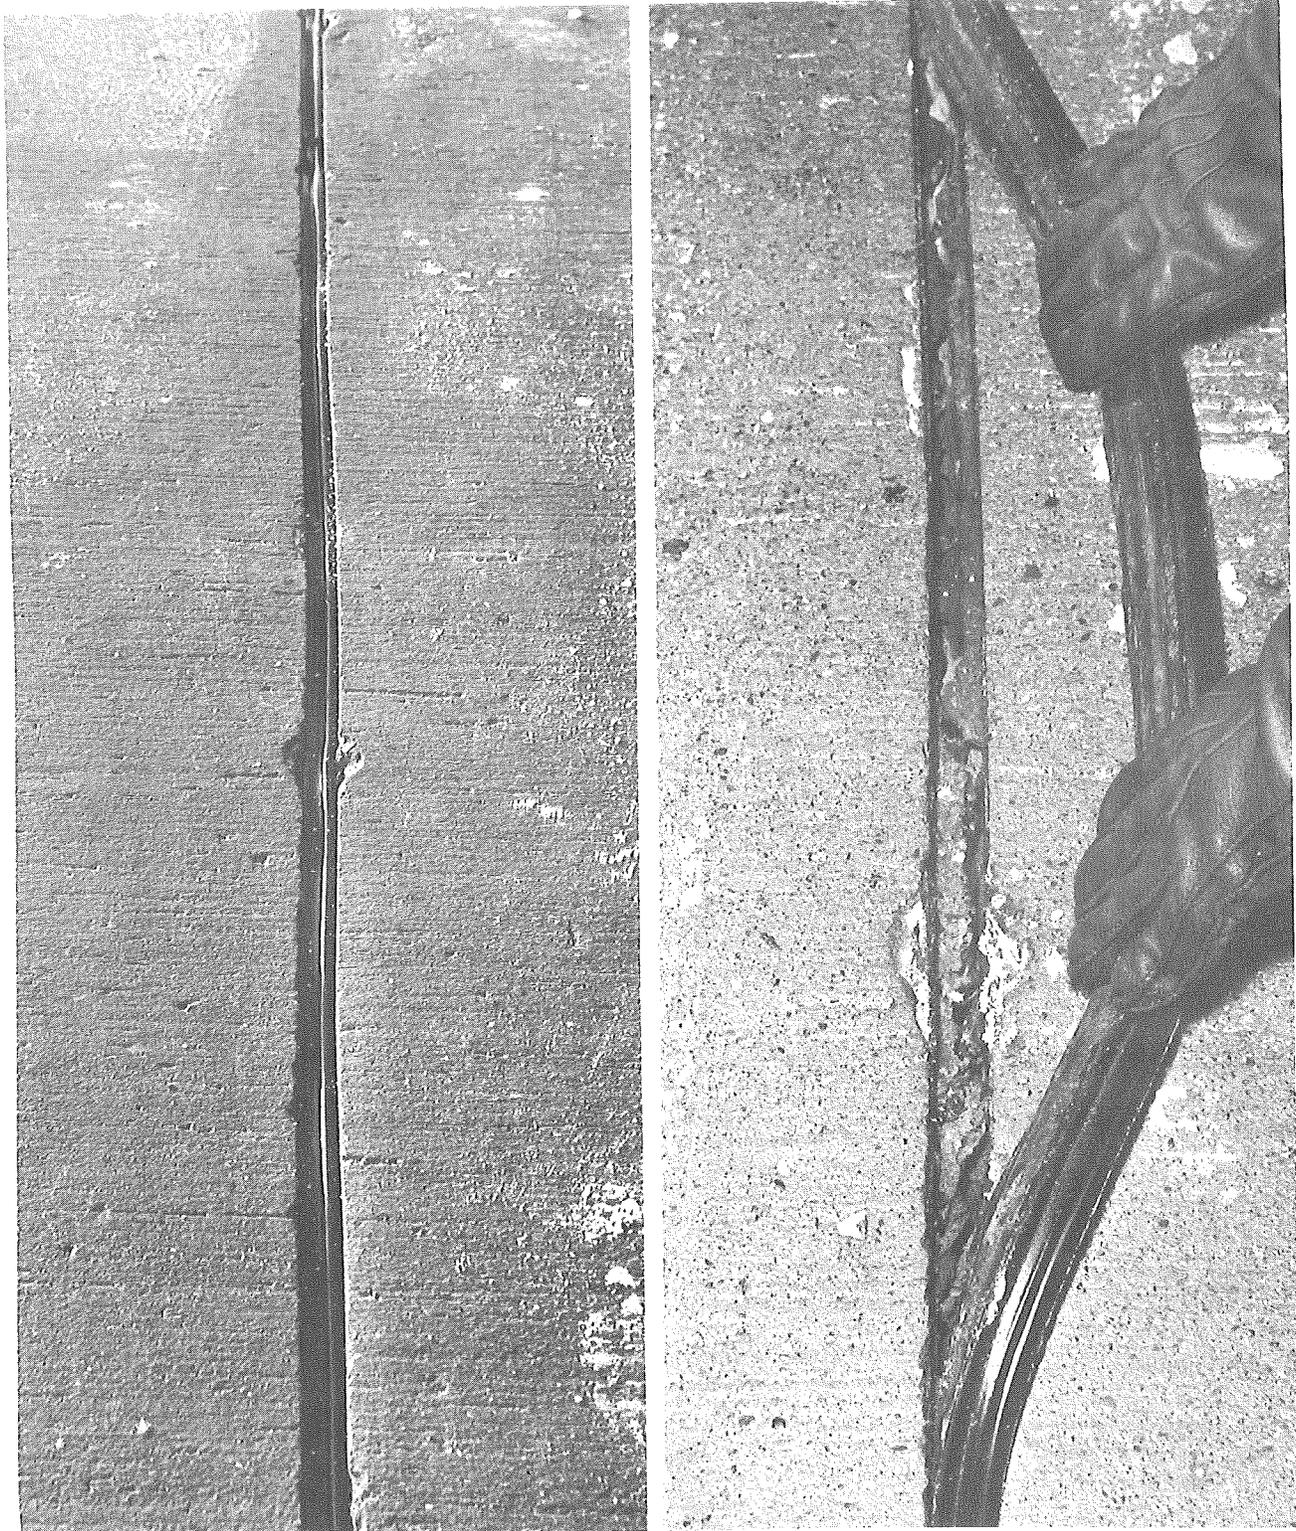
General and detailed views of neoprene sealed joint, showing clean joint groove beneath sealant. Joint was formed by 1/2-in. wide styrofoam, and width when photographed was 0.96 in. (Sta. 600+70, westbound traffic lane, Project EBACI 33083A, C1).
